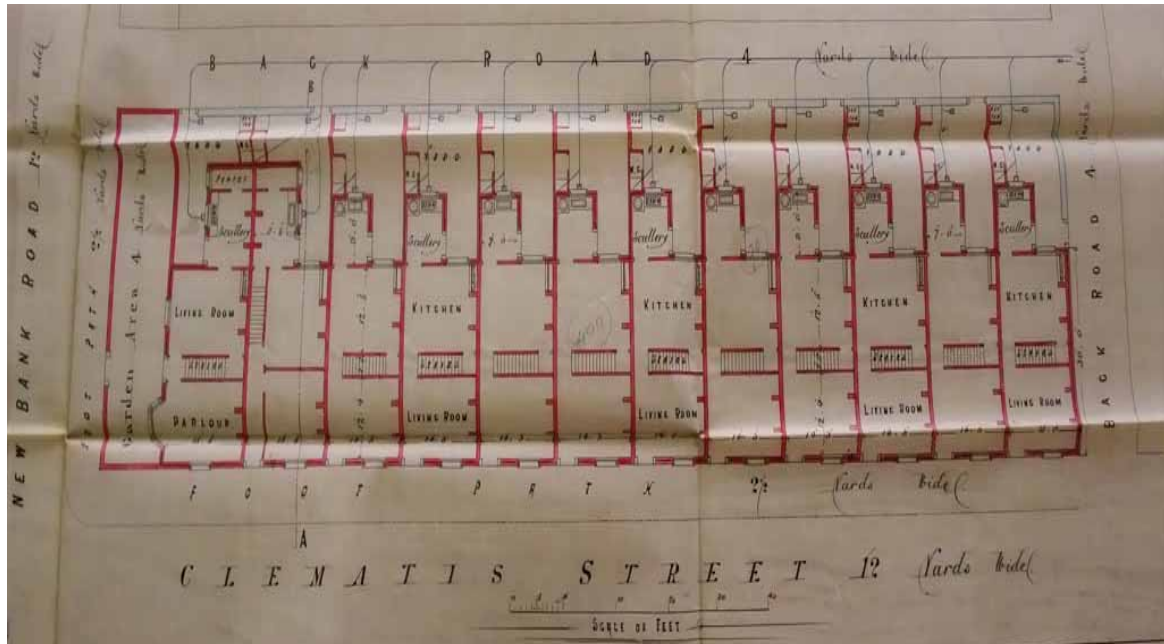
Plan of houses to be constructed on Clematis Road, 1888 (LRO CBBN/3/3 Plan No 3921)
